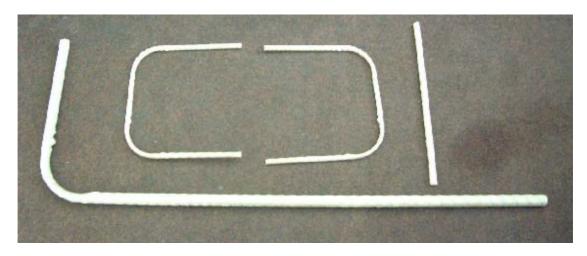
GFRP rebar shapes used as reinforcement for control beam and beam 1
